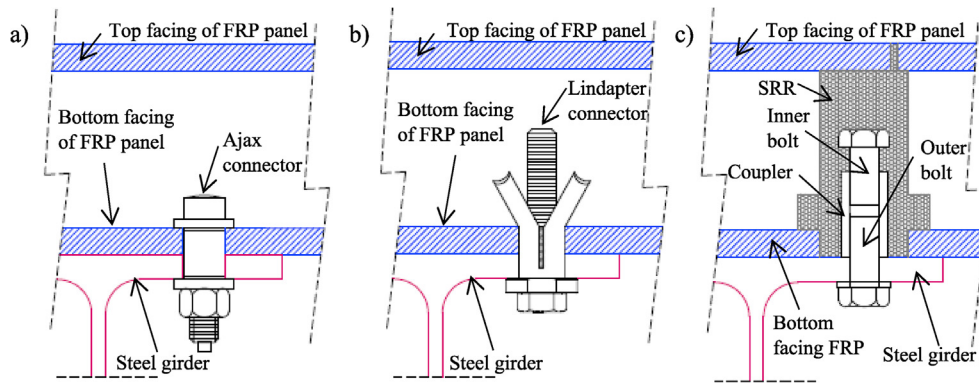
The selected shear connector systems: a) Ajax, b) Lindapter Hollo-Bolt, c) injected SRR connector.
